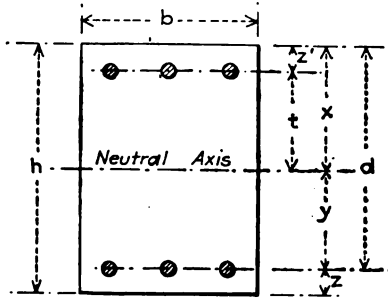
Thacher's Formula, Rectangular Beams, Double Reinforcement.
